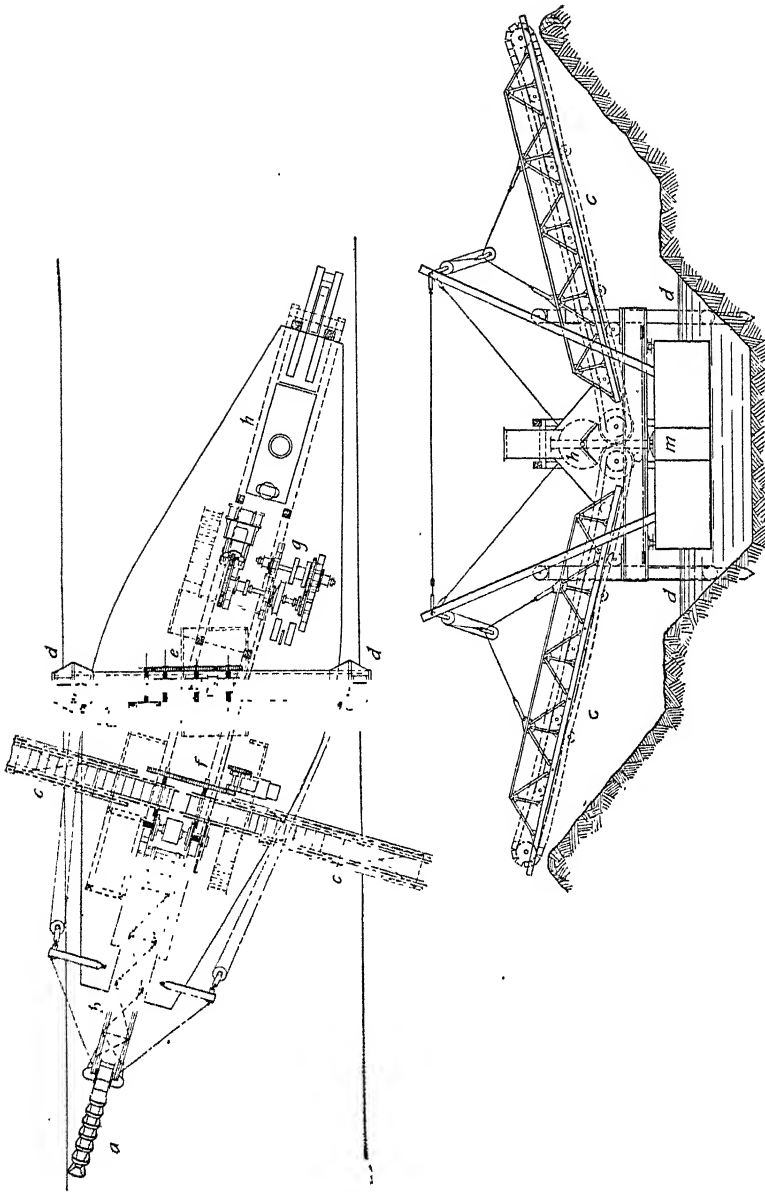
Elevator Dredge for Canal Excavation. *a*, Ladder; *b*, Ladder Frame; *c*, Spuds; *d*, Belt Conveyors; *e*, Swinging Machinery; *f*, Conveyor Operating Machinery; *g*, Ladder Operating Machinery; *h*, Boiler; *m*, Hull
